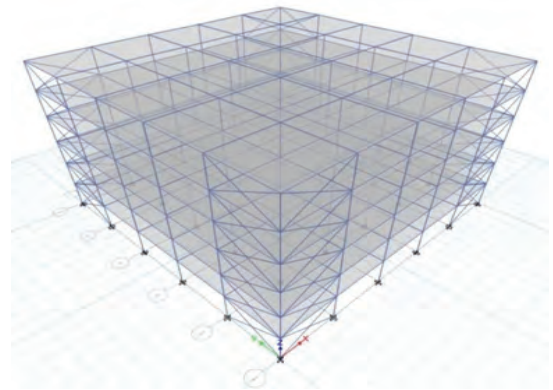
3D model of G+5 storey building with X-pattern BRBs at the corners of building
